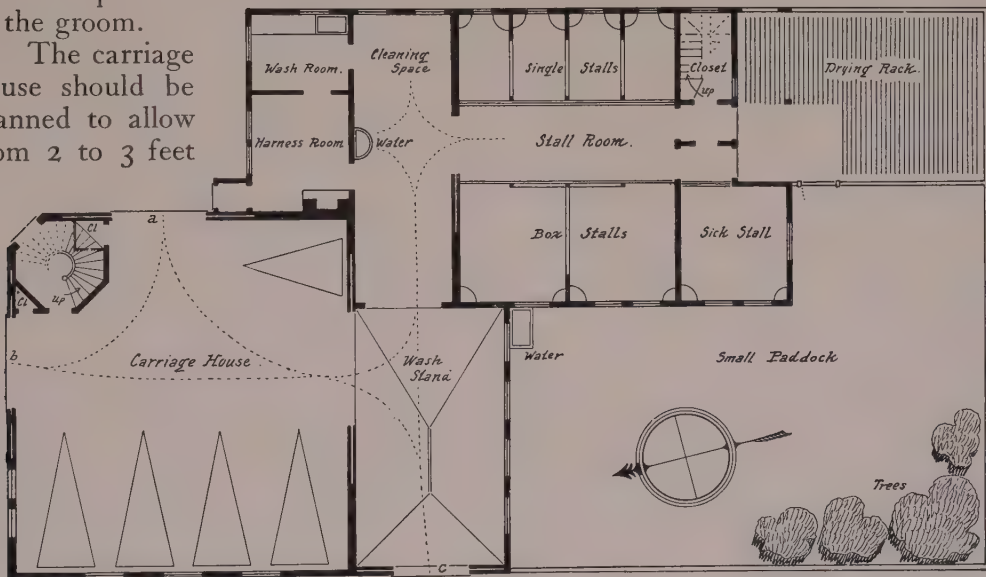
Plan of stable to illustrate the principles advanced in the text
